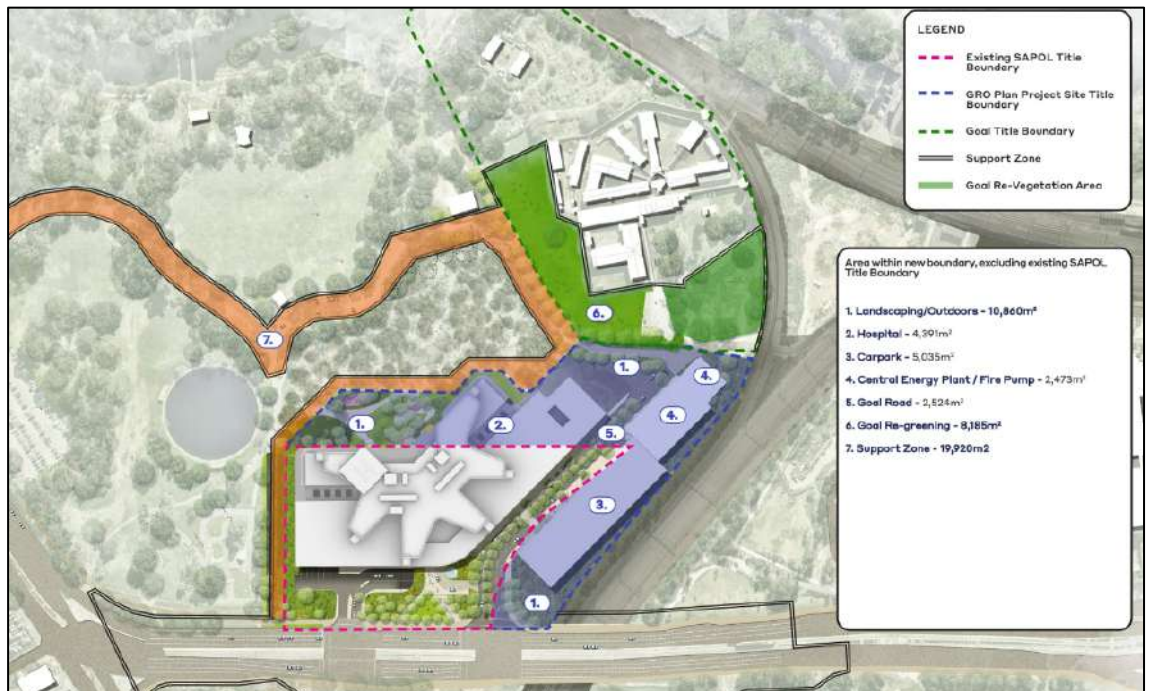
Annotated site plan of proposed development [Source: new WCH Project]
